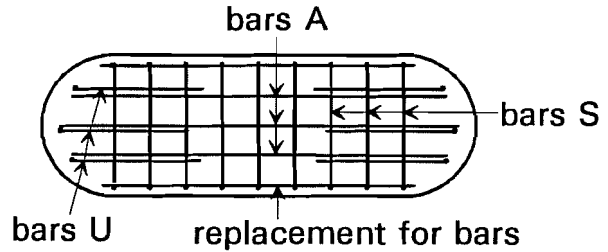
Improper placement of bars U in Specimen A1 and A2
